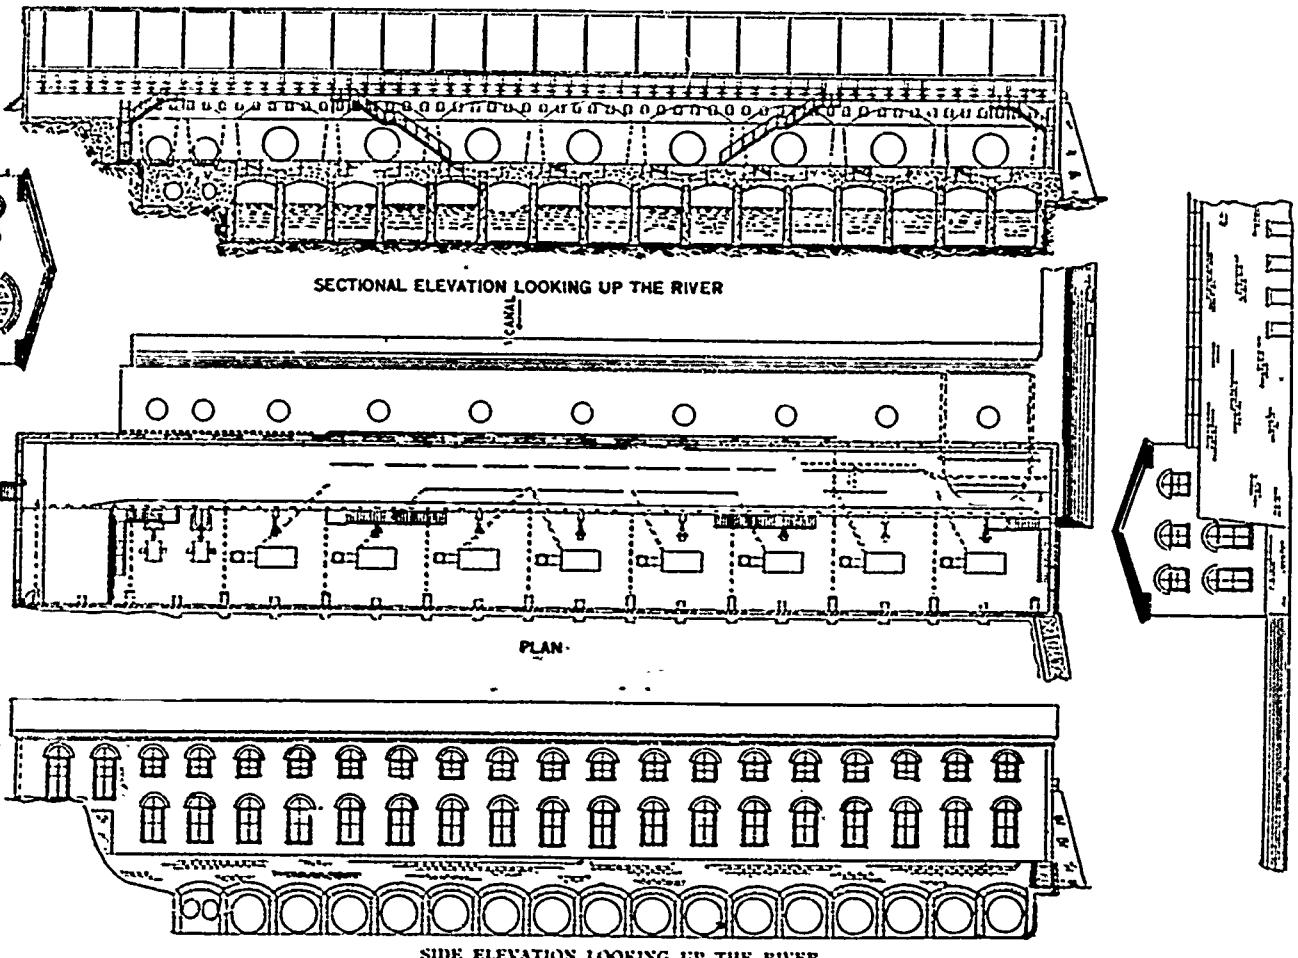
PLAN AND ELEVATION OF POWER HOUSE.
